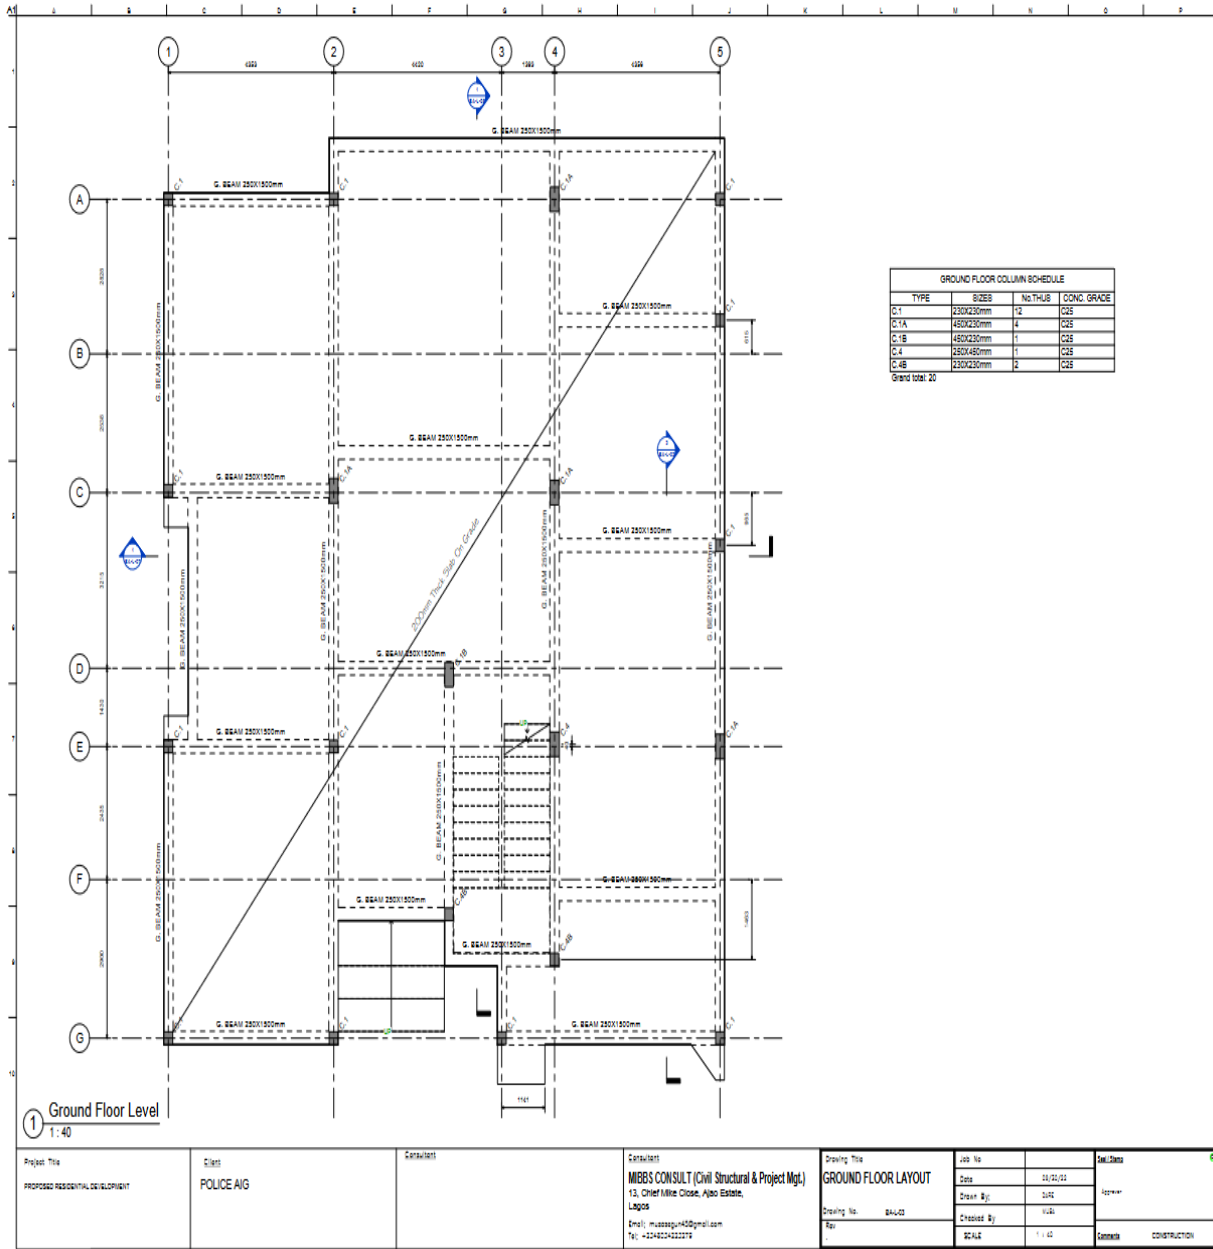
STRUCTURAL GROUND FLOOR OF THE INVESTIGATED BUILDING
